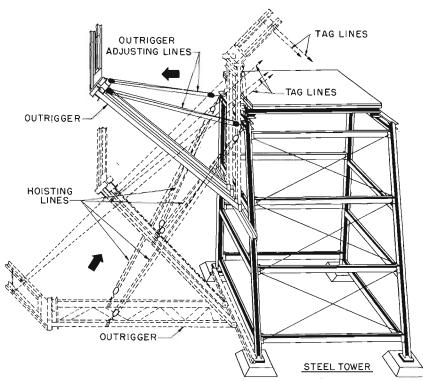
Two gin poles connected with bracing, rollers, and guide frame serve as outriggers used to launch long steel stringers from bridge deck. Successive steps in raising outriggers are shown.
